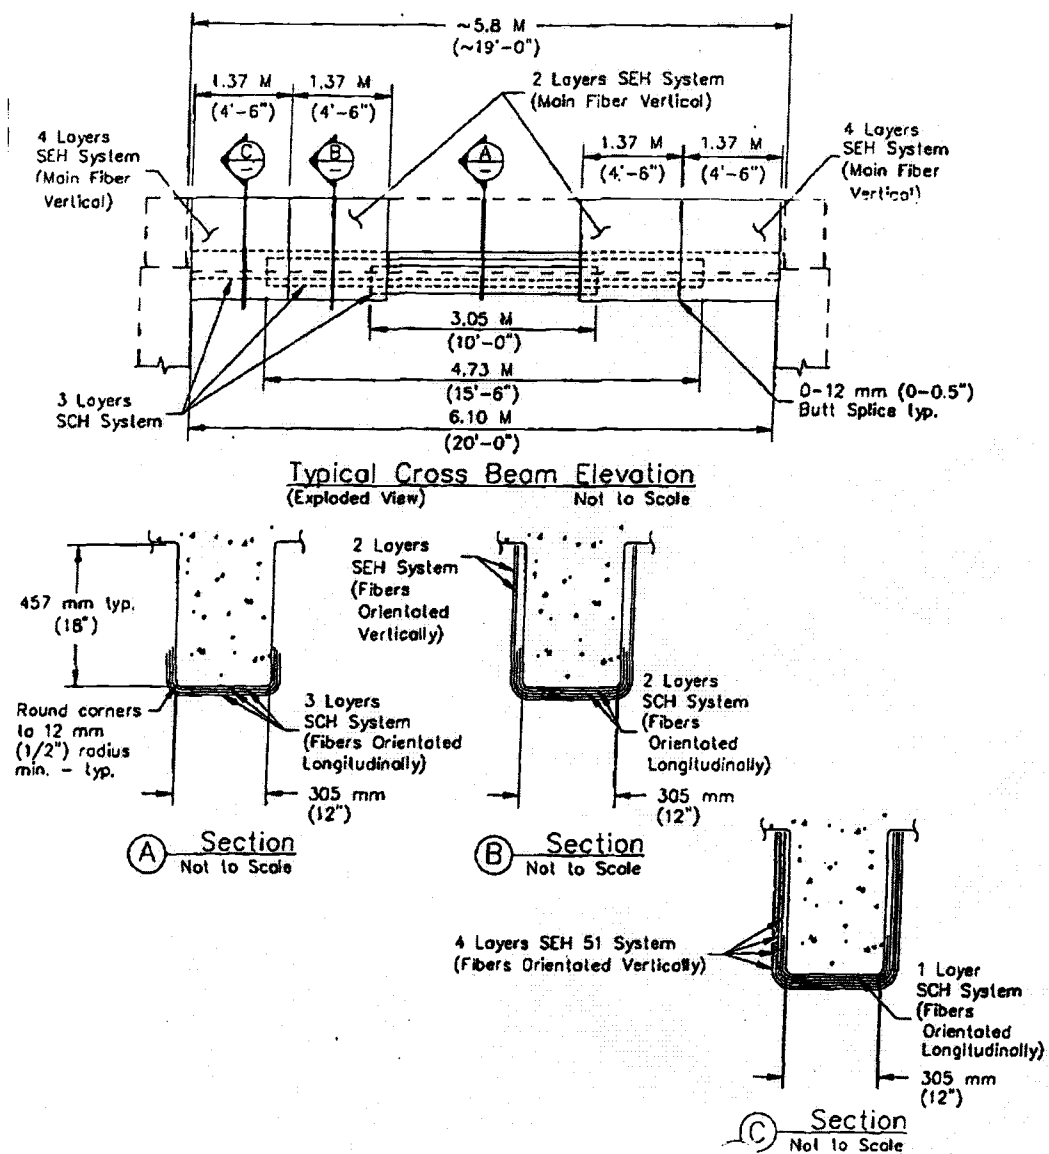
Typical FRP Reinforcement Details in Transverse Beams
